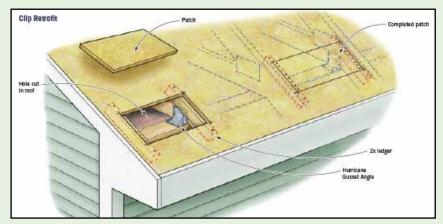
To install connectors with minimal demolition, cut rectangular holes between pairs of trusses. A connector can be attached to a truss on each side of the hole, allowing four trusses to be attached with just two holes. Holes are patched by resting the patch on scabs nailed to the sides of the trusses. Source: Coastal Contractors Online.
